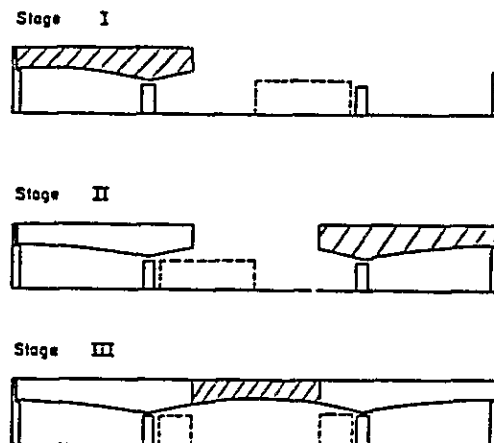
CONSTRUCTION STAGE AND DETOUR PLAN DURING CONSTRUCTION
